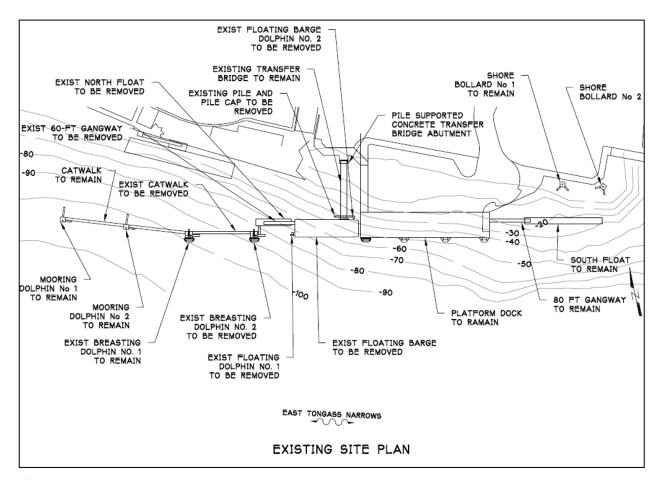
Existing site plan at Ketchikan Dock Company's Berth IV showing existing structures to be removed and those to remain.
